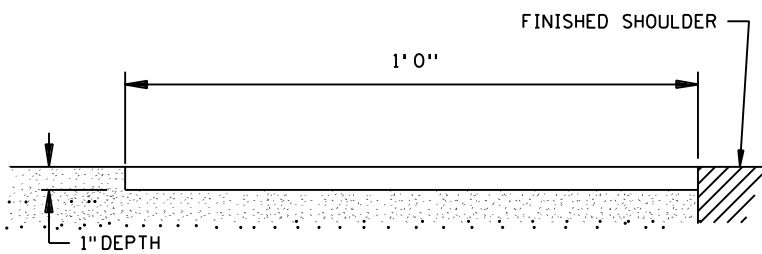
CONCRETE PAVEMENT OPTION A - MODIFIED STRUCTURAL RUMBLE STRIP
